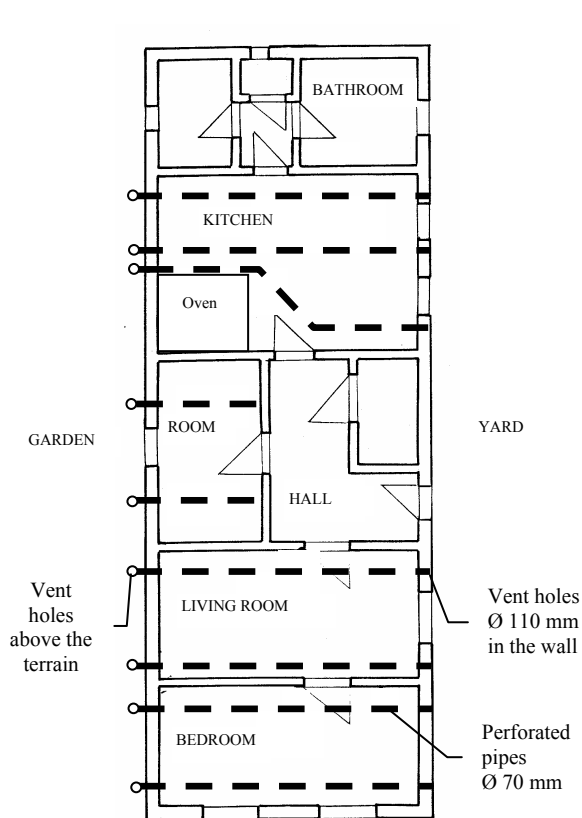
Ground floor plan of the house with the soil ventilation system adopted during the first attempt at mitigation
